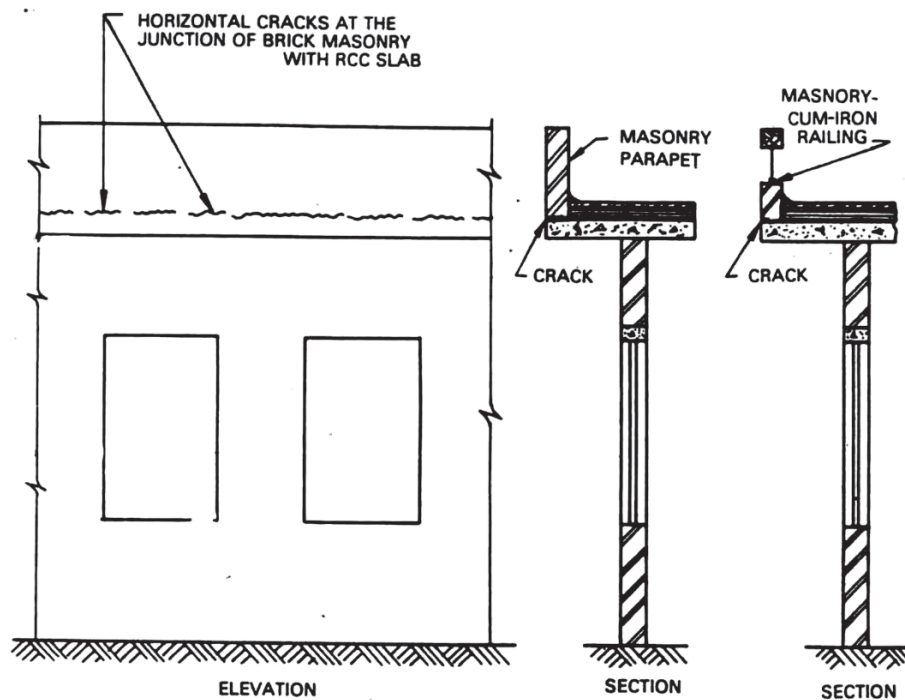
Horizontal crack at the base of brick masonry parapet (or Masonry-cum-Iron Railing) supported on a Projecting RCC slab (Ref : SP25 (S&T) 1984)
